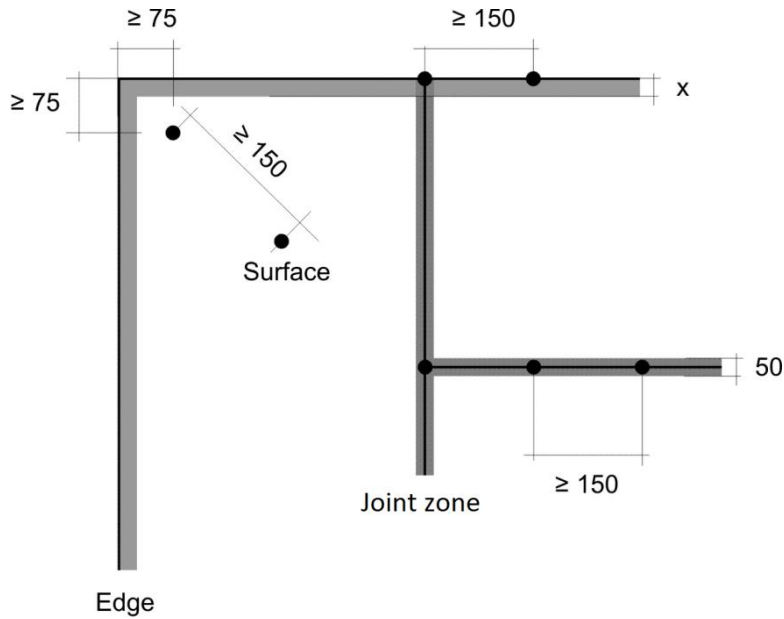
Three distinct areas (surface, edge, and joint zone) where impact testing of the EIFS specimen is performed, shown in plan view. (x: 1/5 projectile diameter, dimensions in millimetres)
